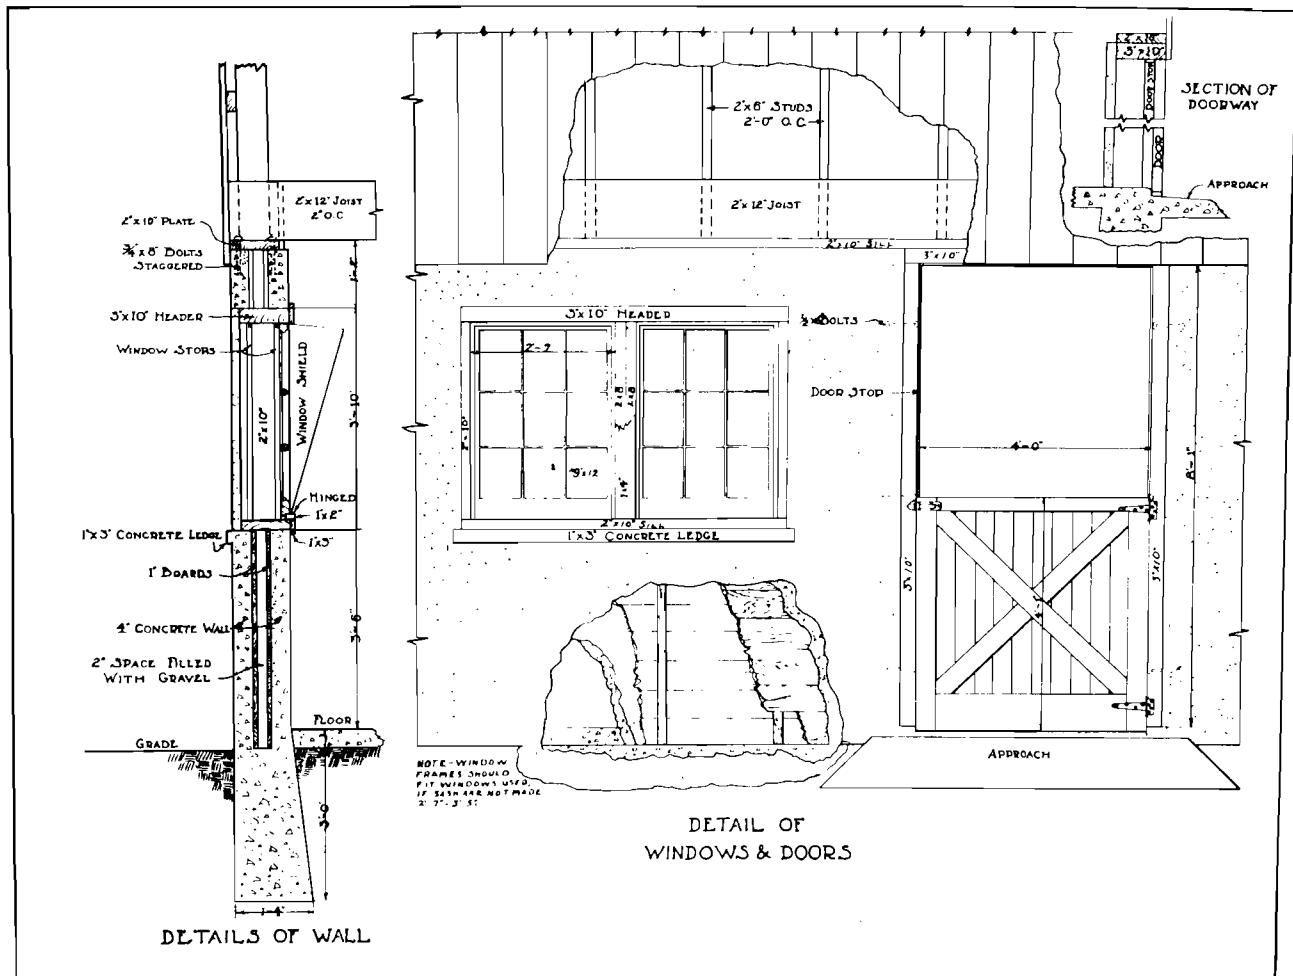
Details of insulated double concrete wall for W. A. Cady. Concrete alone produces a cold barn.
